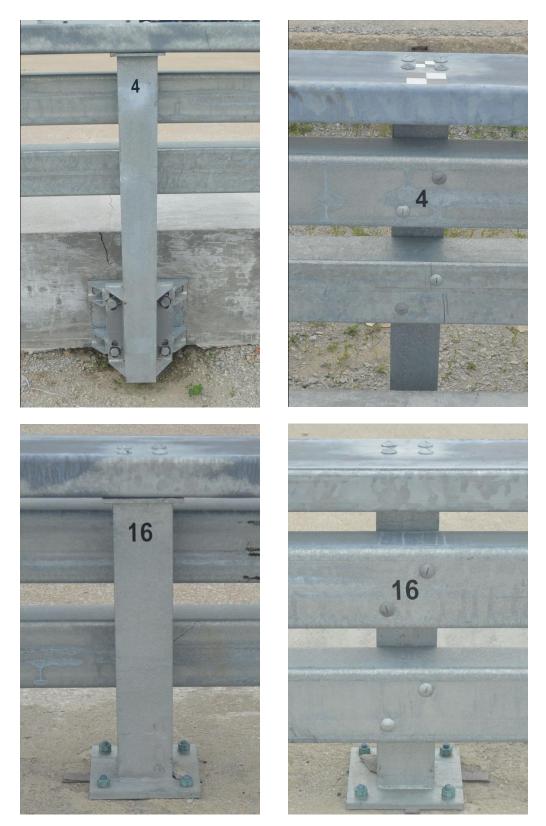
Test Installation Photographs, Side-Mounted and Top-Mounted Posts, Test No. STBR-4
